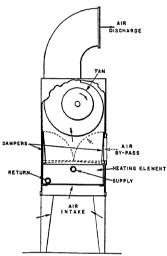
Floor Mounted Unit Heater, Housed Type Fan
